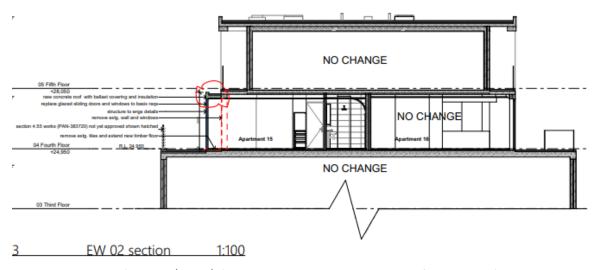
Proposed (DA-373/2023/D) section detail with concrete roof RL 27.850 (Level 4 FFL 24.950 + 2.9). Increase in height of 220mm over the approved height. (Source – RAA Architects)
